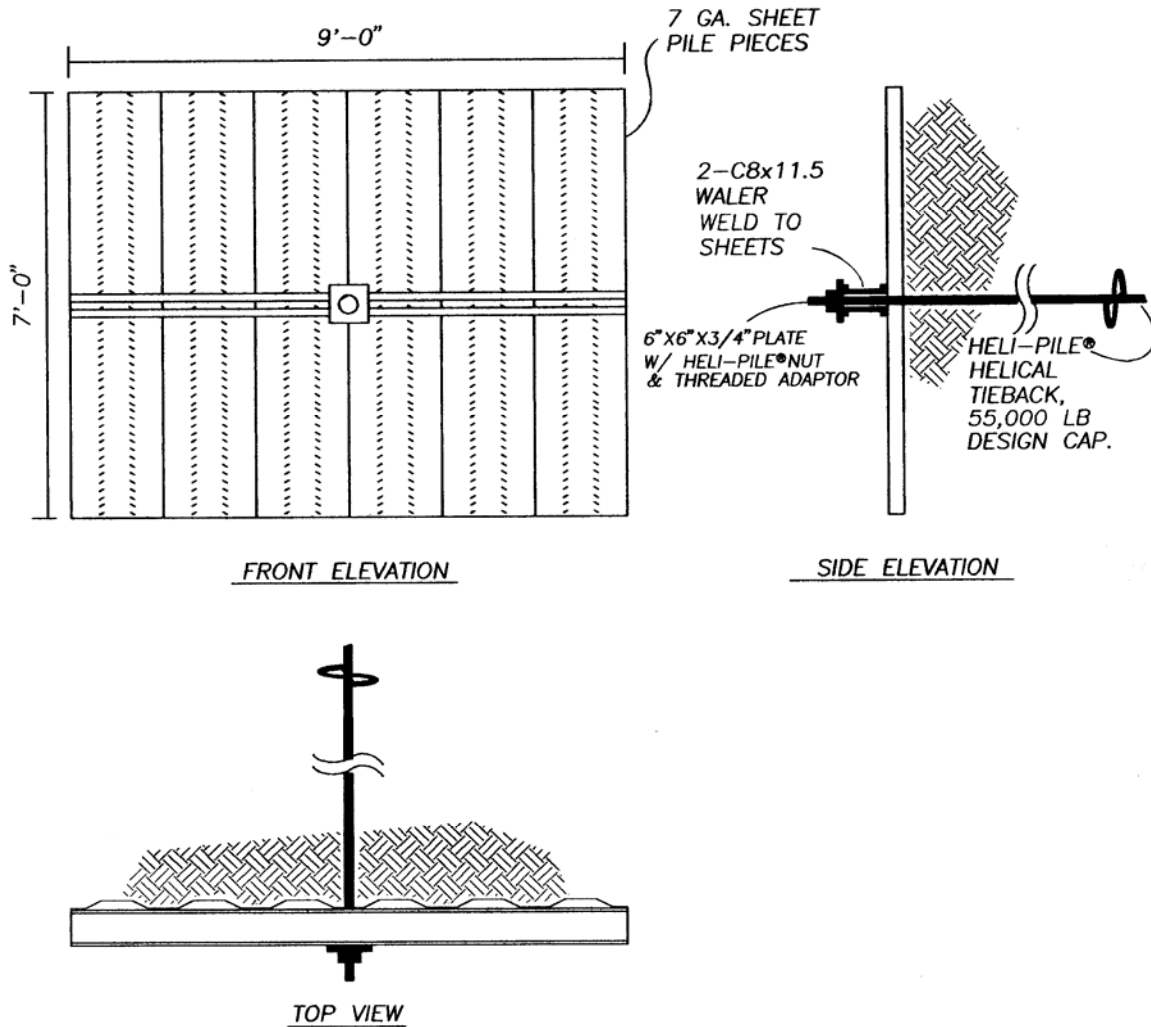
Example of Shoring Panels using Helical Tension Anchors as Tiebacks (See Photos 1-45 and 1-48 to see this shoring panel in place in shoring walls.)
